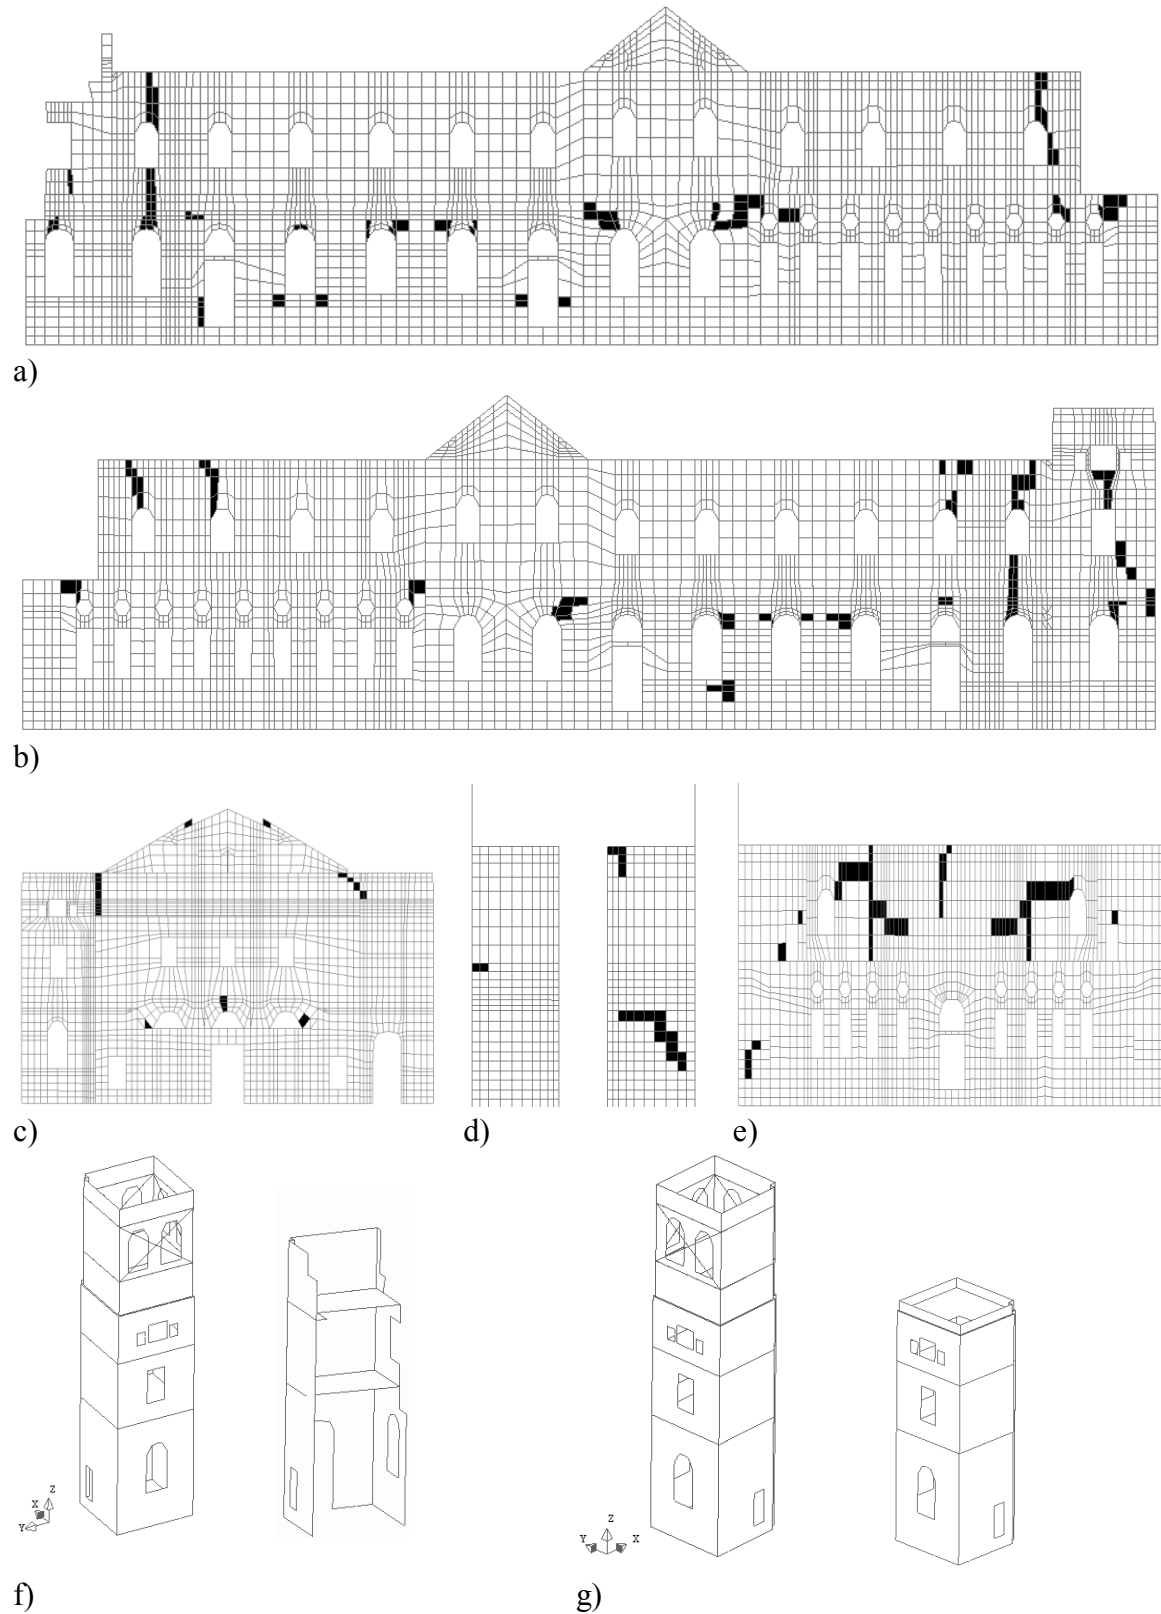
Damage in shell elements (shadowed elements): a) South elevation; (b) North elevation; (c) West elevation; (d) West façade of the transepts (d) East elevation; (f) Undamaged (left) and damaged (right) South bell tower; (g) Undamaged (left) and damaged (right) North bell tower.
